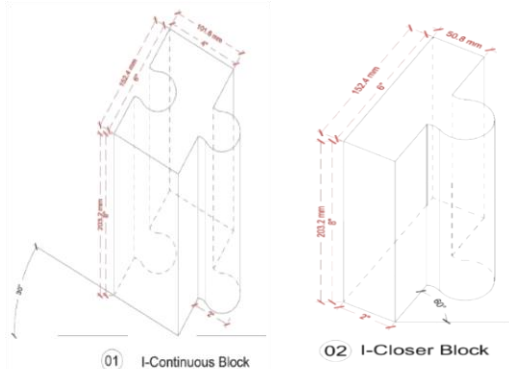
New Developed Mortar-Less Interlocking Wall Block
